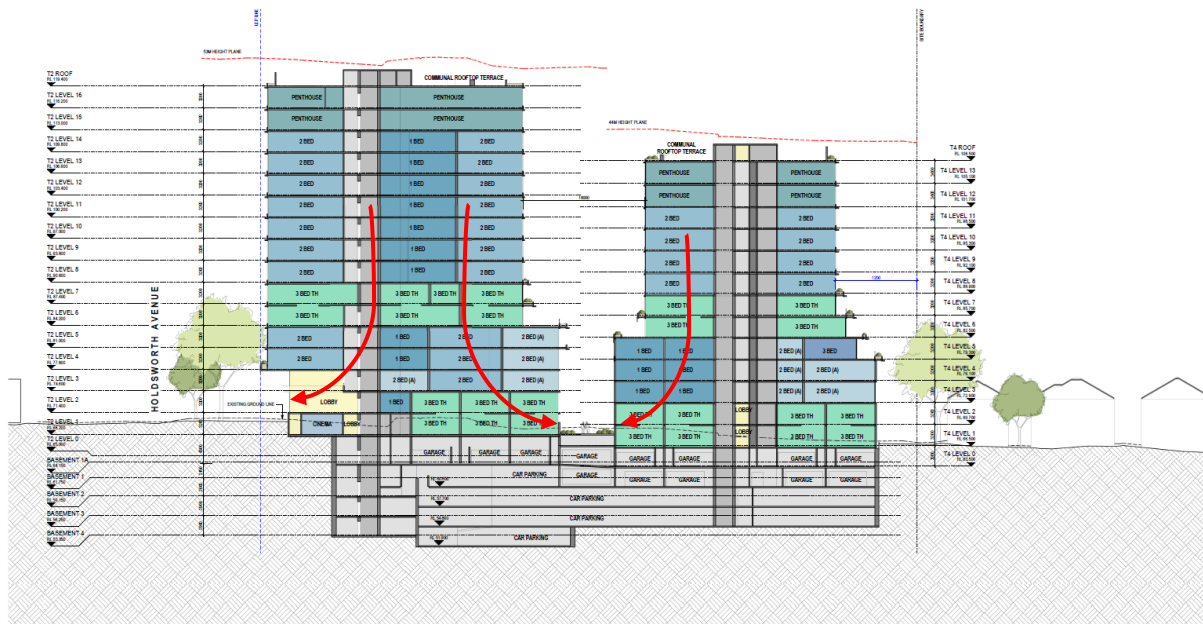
Flow paths through tower gap and undercroft, Towers 2 and 4, west elevation
